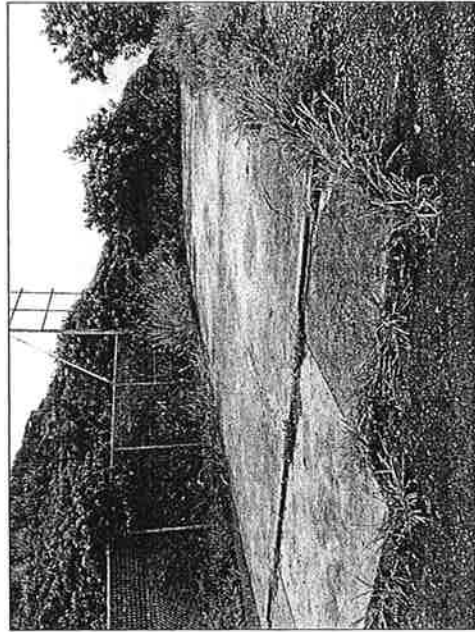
Photo of the large rectangular concrete foundation (Foundation A), view to north
